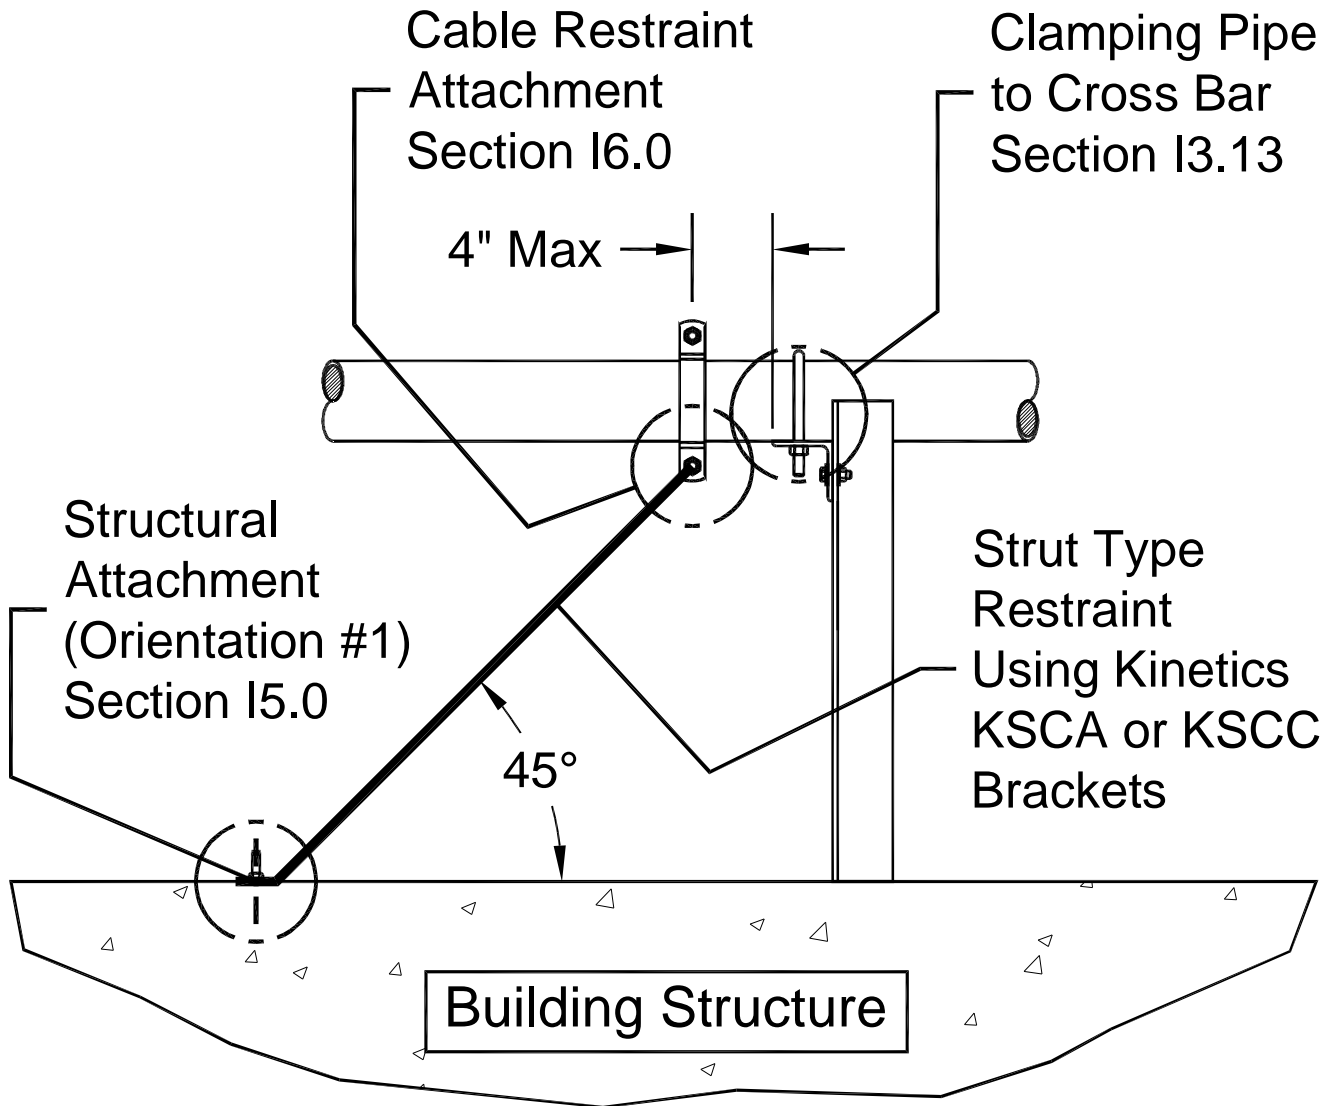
; Longitudinal (L) Strut Type Restraint Schematic for Floor/Roof Mounted Pipe – Strut Attached to the Duct at a 45° Angle
